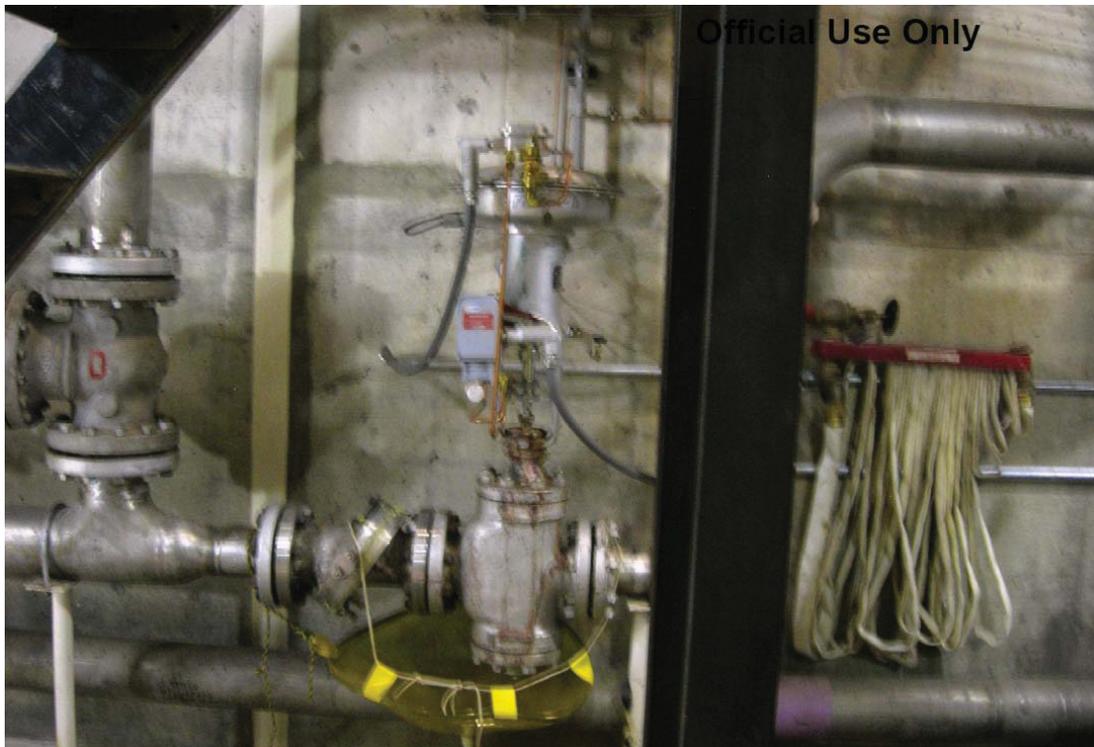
15. Photo P9-M4-M6-DSCN0004 (AIWS, second, third, and fourth sections of wall strap spacing between GT(1-47) and AIWS (3"(strap) + 36"(concrete))
